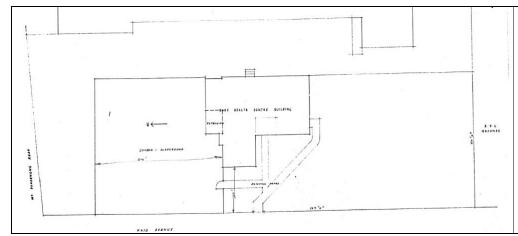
1966 site layout plan, showing 'garden playground' at north end of the site and main entry with footpaths from the west (Haigh Avenue, now Civic Square). (Source: Council building files)
